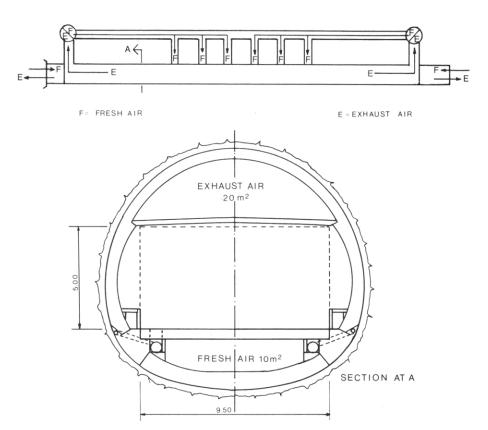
Ventilation scheme and cross-sections, Option IIb.
